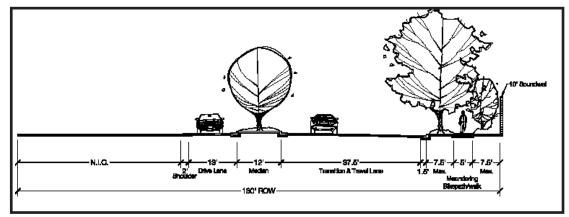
Arterial Road - Airport Way North of Woodbridge Entry, Section H
